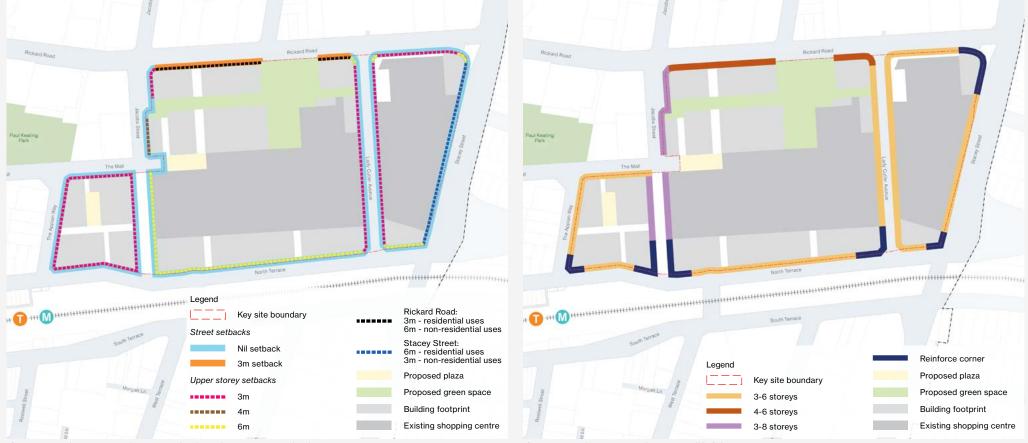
Bankstown Central - Street setbacks and upper storey setbacks
